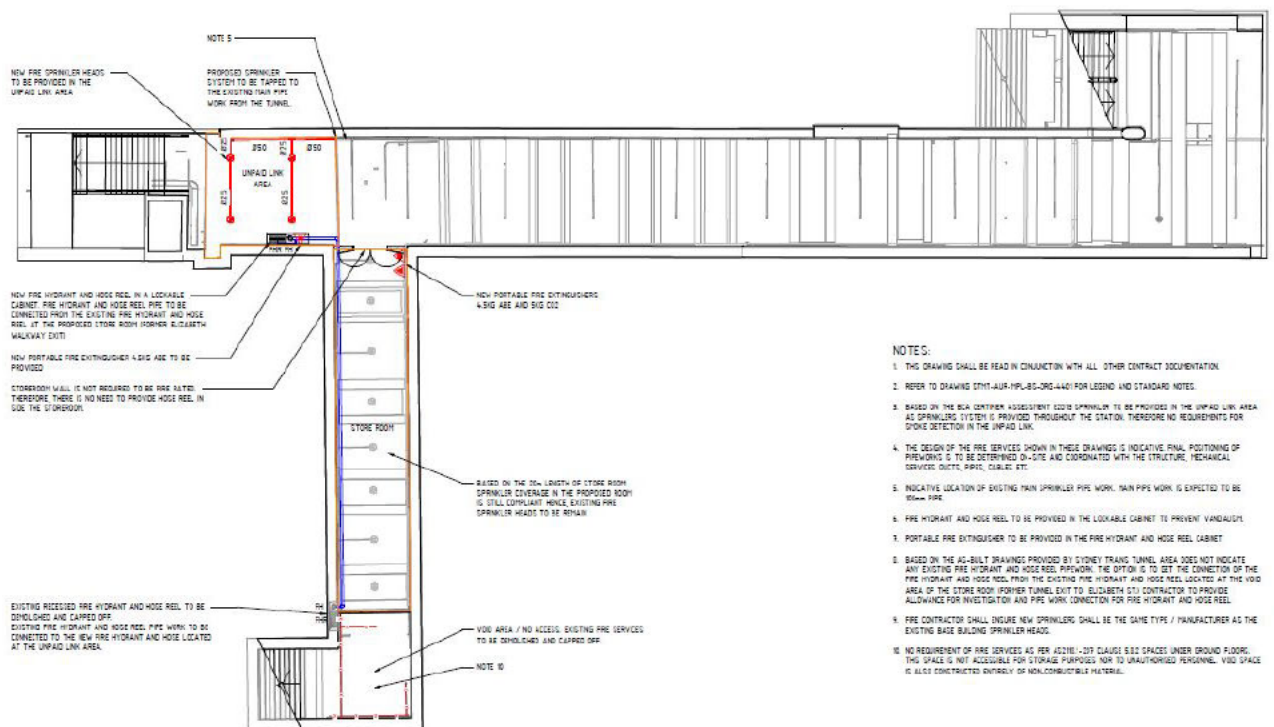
Wet fire proposed plan – removal of existing fire hydrant and fire hose reel, location of new fire hose reel and new sprinklers and fire extinguishers. Source: Transport for NSW 2024
